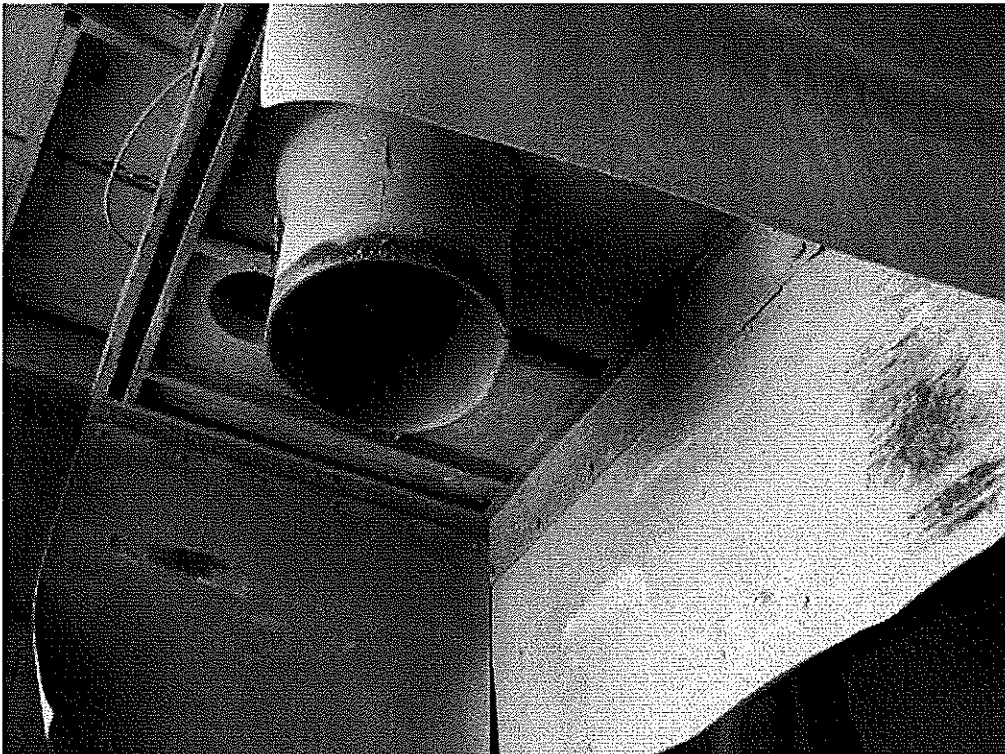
(Photo 2) : Hood with flaps lowered into place, to provide enclosure for loadout spout.
